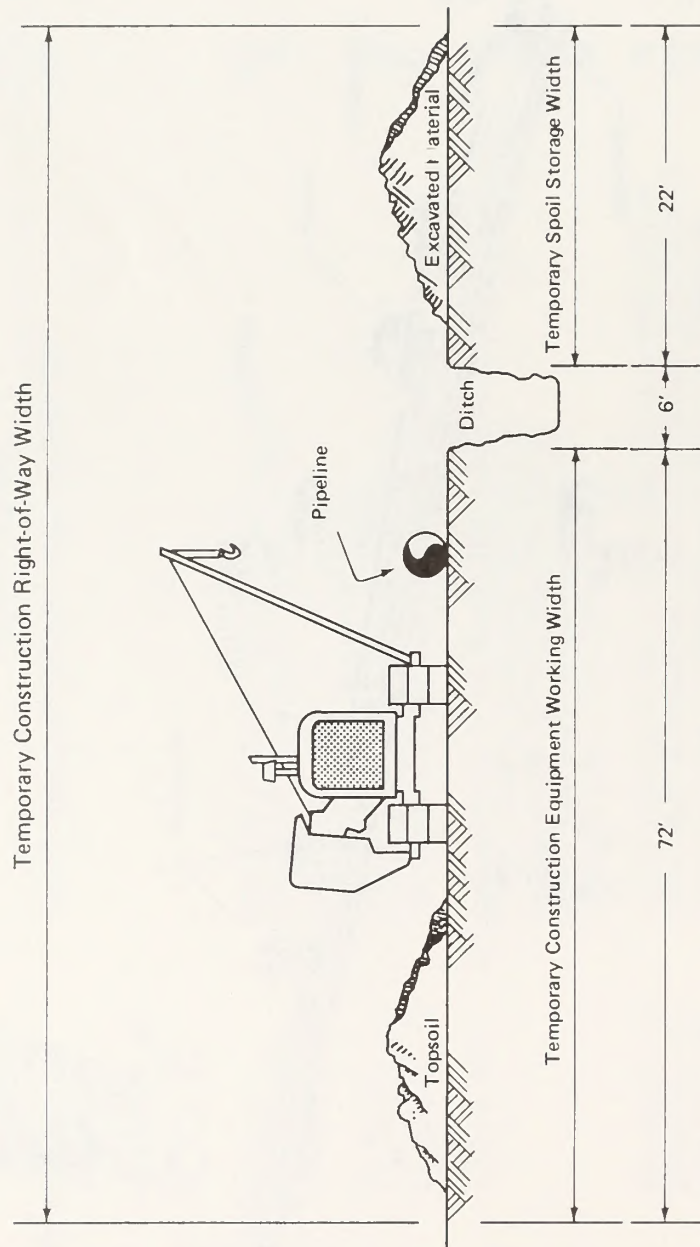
CONSTRUCTION RIGHT-OF-WAY CROSS SECTION
